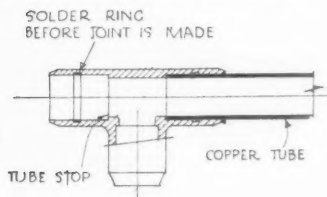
Capillary joint system in which the solder is pre-fabricated in annular grooves in the fitting, requiring only application of the blowlamp to complete the joint
